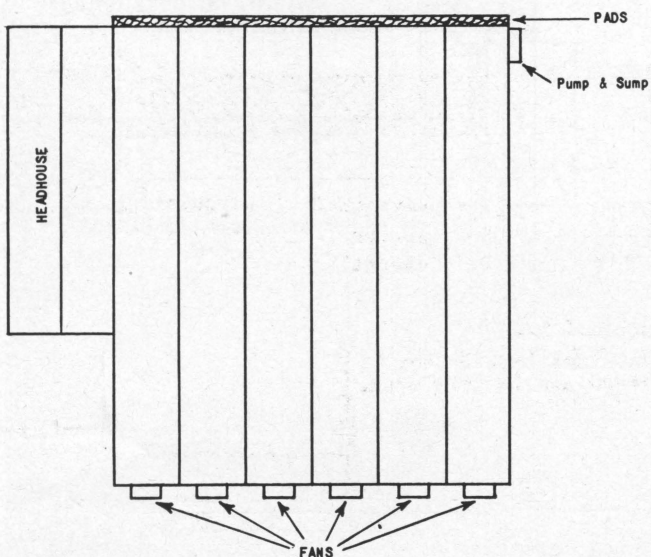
Installation showing pads and fans located on endwalls on ridge and furrow construction.
